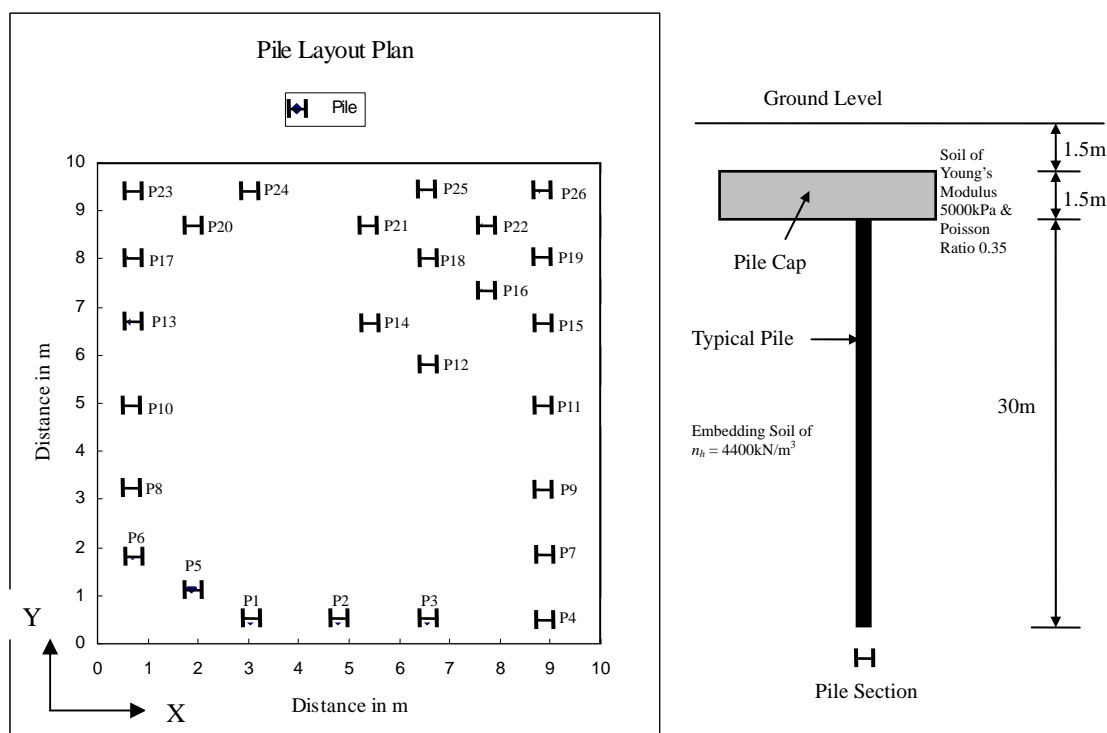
Piling Layout Plan and Details for Worked Example HQ-1
